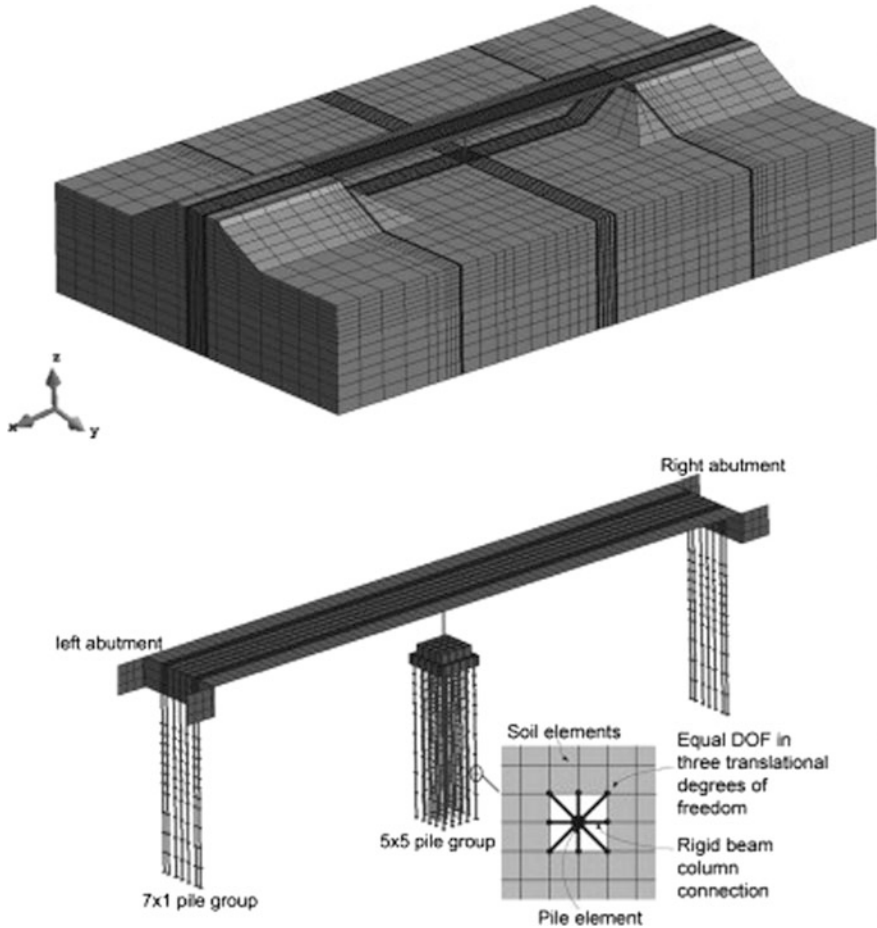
Three-dimensional finite element meshes to model the bridge piles and the surrounding soils [273]
